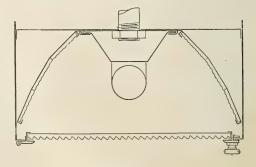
DIAGRAM, SHOWING ARRANGEMENT OF TYPICAL CEILING UNIT.
